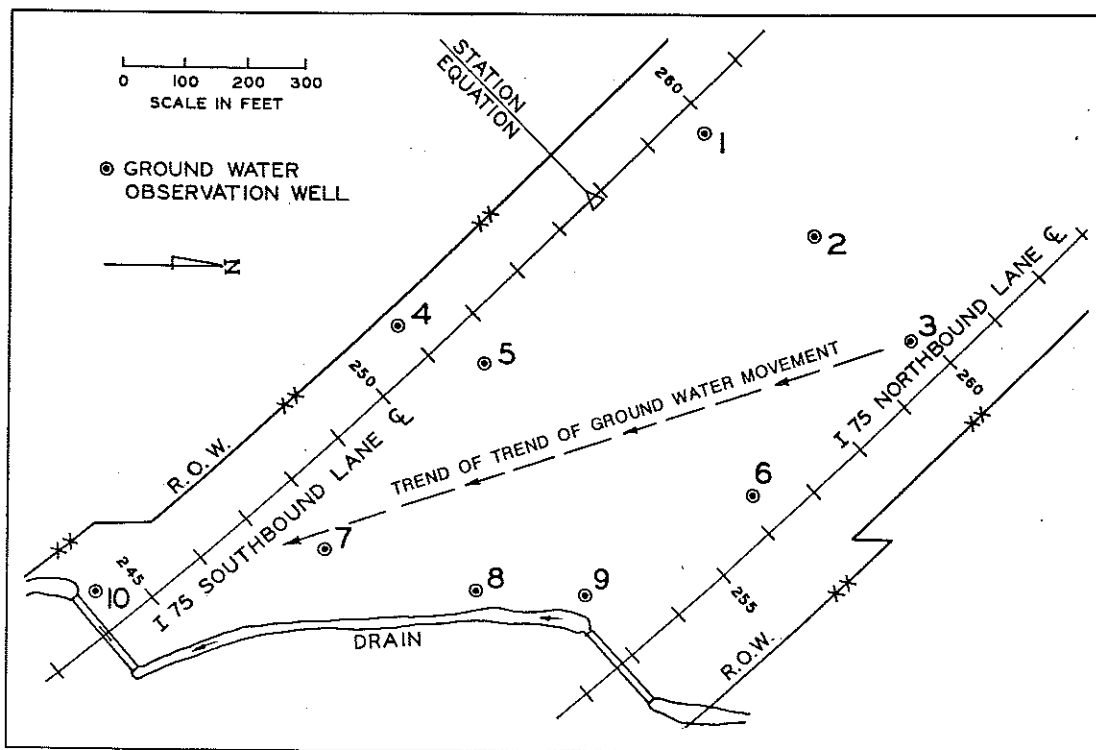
I 75 well locations: I 75 south of West Branch (Section 16, T21N-R2E, Horton Twp, Ogemaw Co.). Roadway opened to traffic in 1971.
